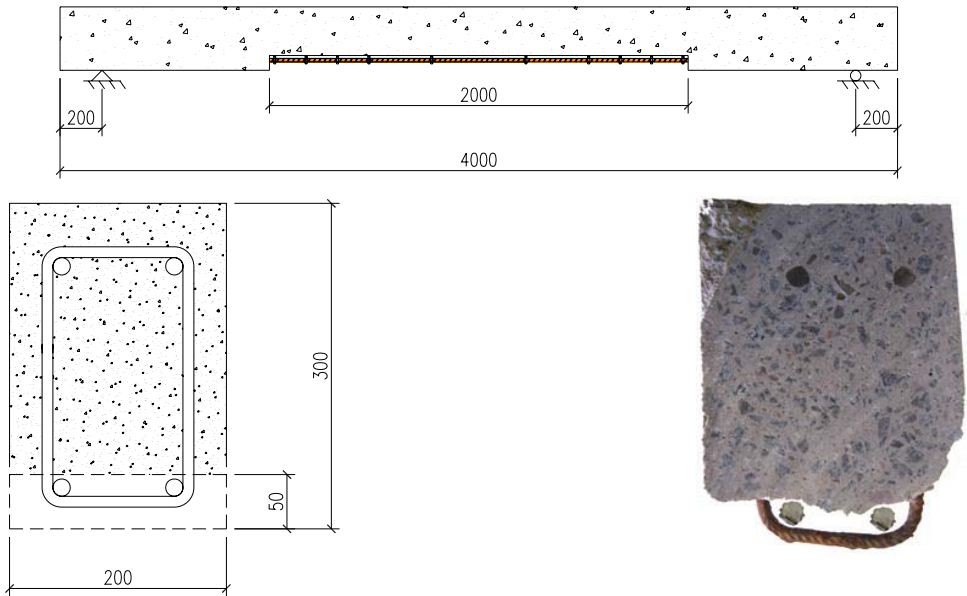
Top: Beam specimen measurements and steel reinforcement layout. Bottom left: Cross sectional view of beam where cover concrete was removed. Bottom right: Cross section of real beam where cover concrete was removed.
